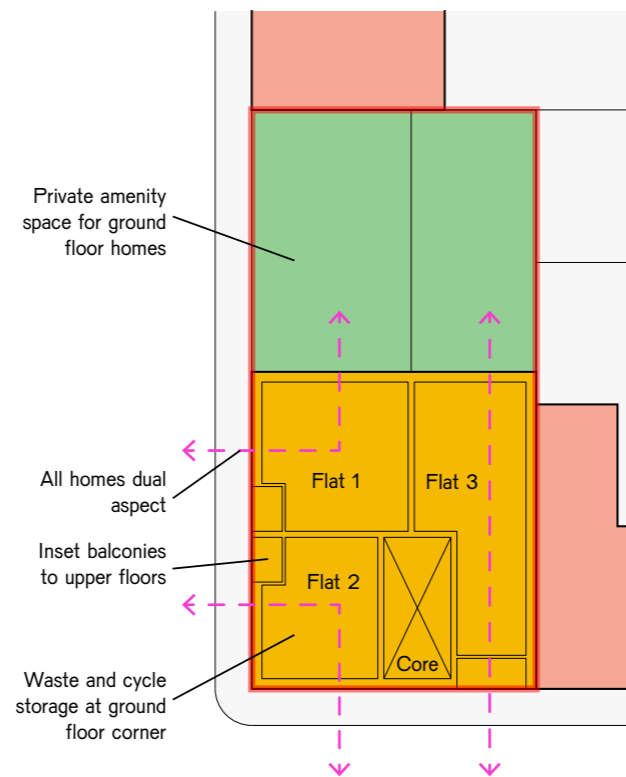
Potential upper floor plan of corner infill development to achieve dual-aspect homes
